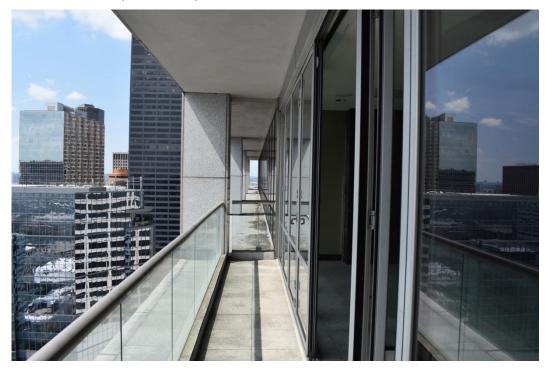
Floor 29, typical exterior spandrel deck and column, view east
